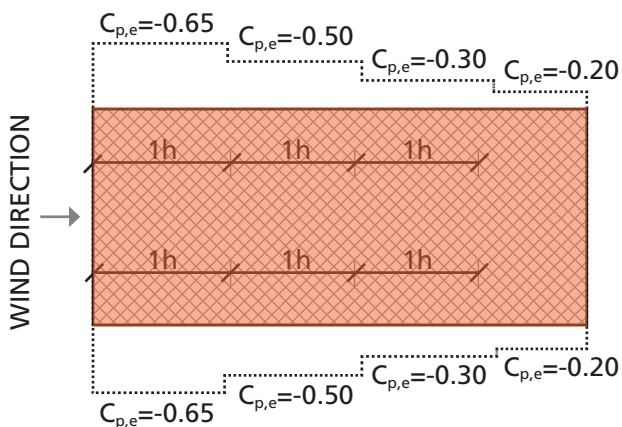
(A): $C_{p,e}$ FOR SIDE WALLS
